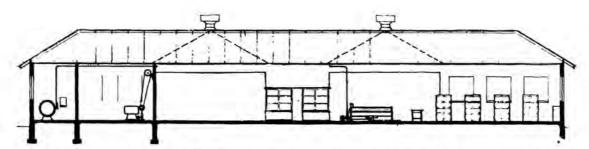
Section through disinfector, foul linen, receiving room and packing room, looking through into wash house and ironing room,
